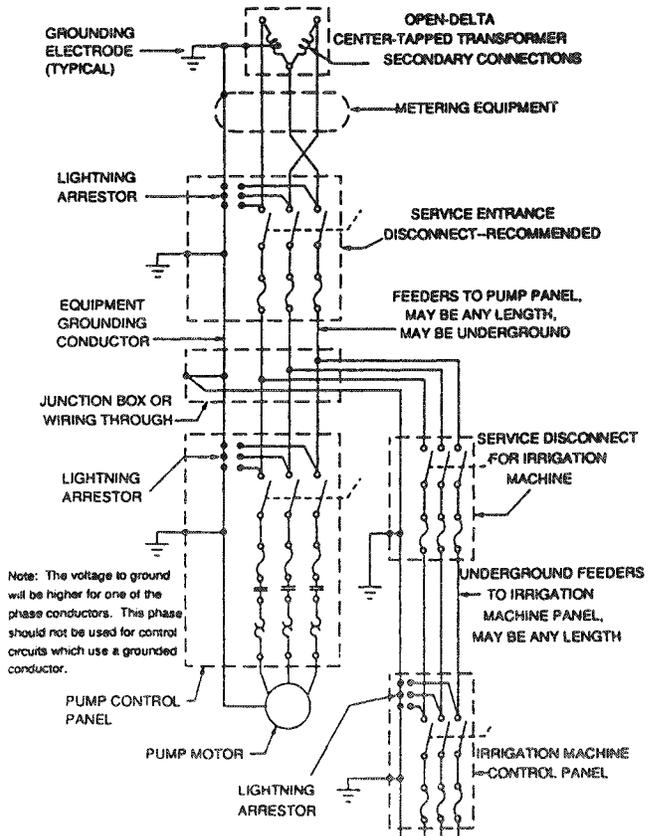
Recommended equipment and grounding for open-delta, center-tapped transformer secondary connections
